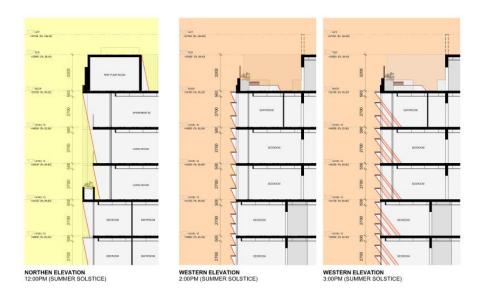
Section through north and west elevations showing horizontal louvre performance at midday on the summer solstice.
